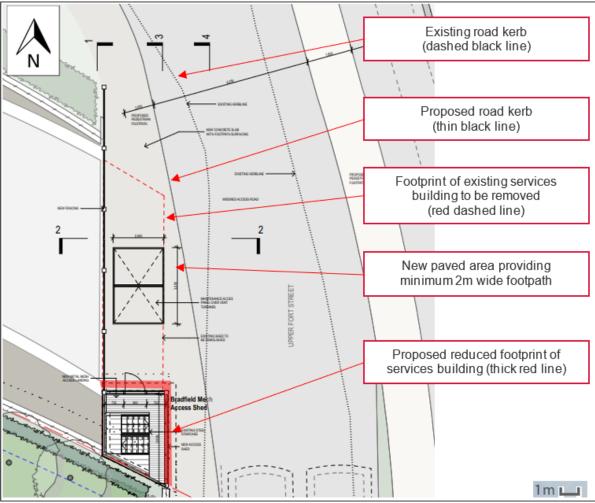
| Proposed widening of Upper Fort Street (Source: Applicant's EIS 2020)
